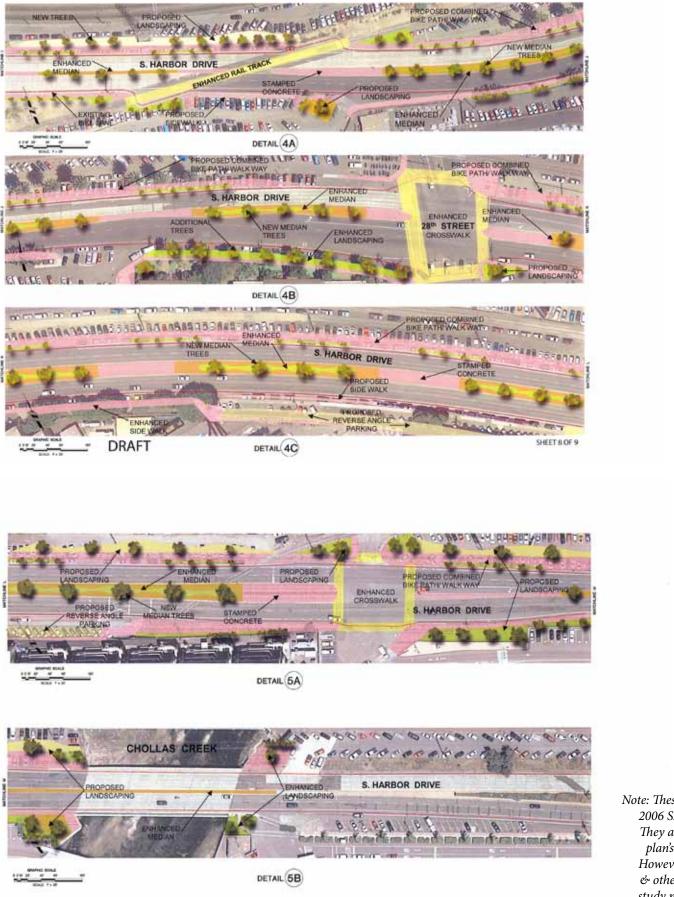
Conceptual Plans & Graphics from the 2006 SANDAG Bayshore Bikeway Plan
